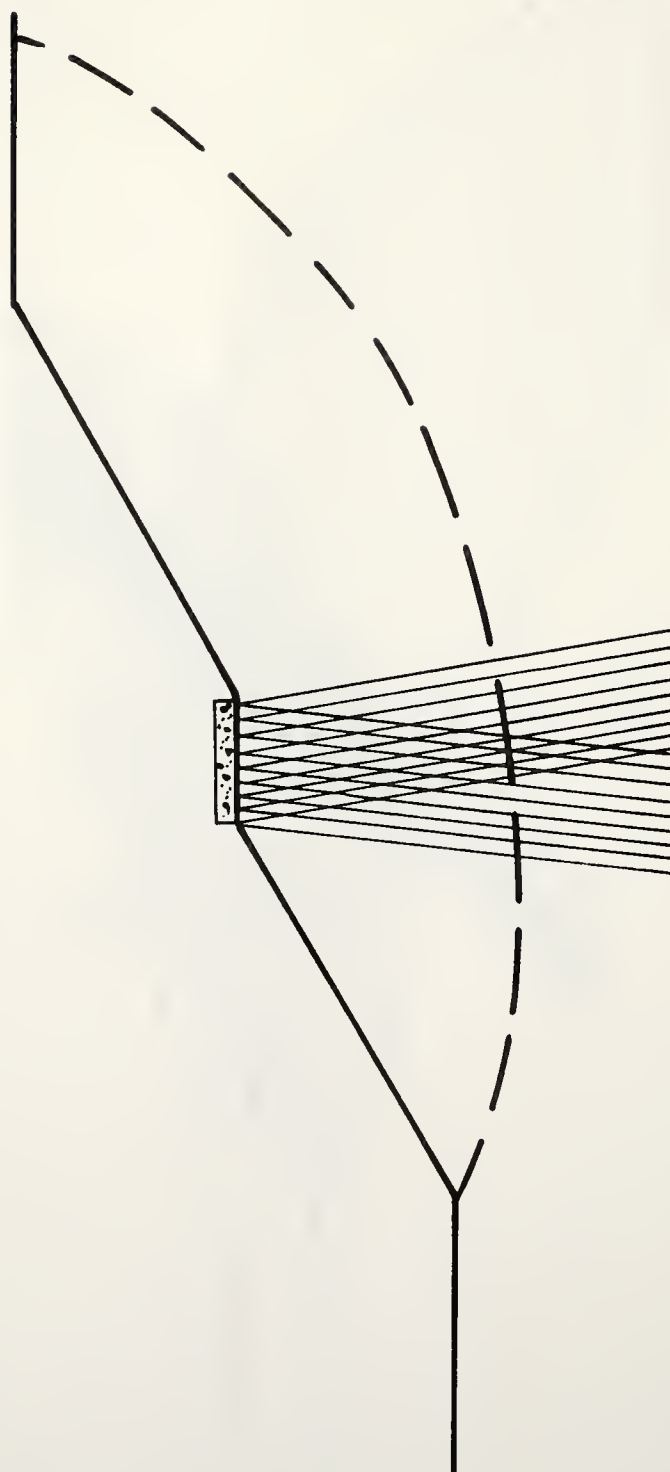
Fondedile Root Piles Used to Stabilize Slopes
